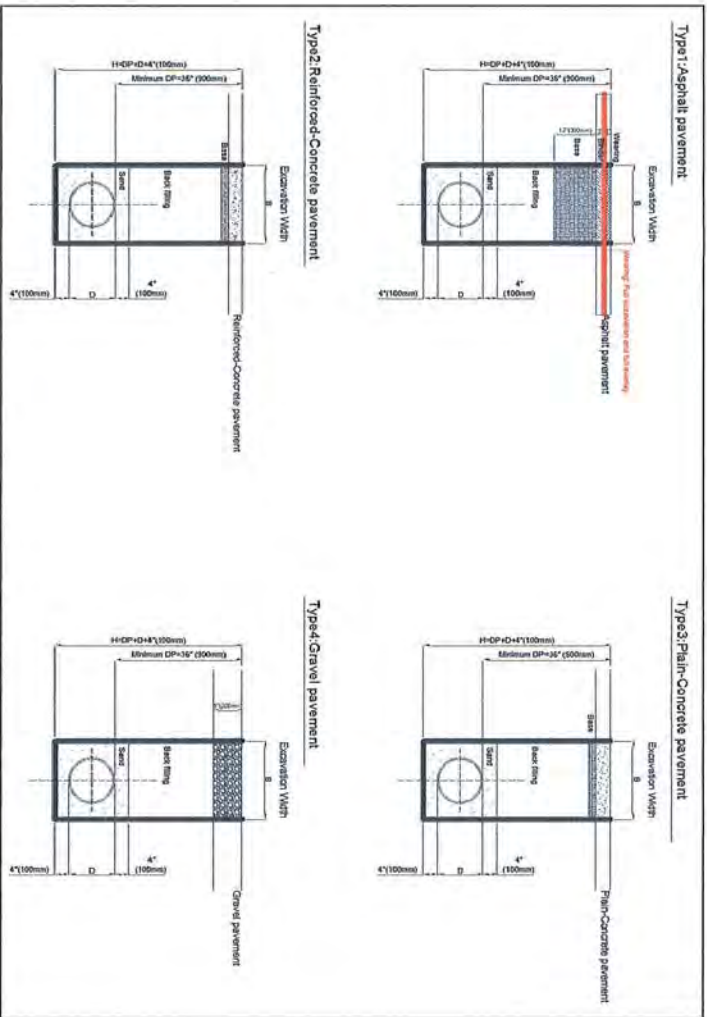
Standard cross section drawings of excavation and re-pavement of each pavement type
